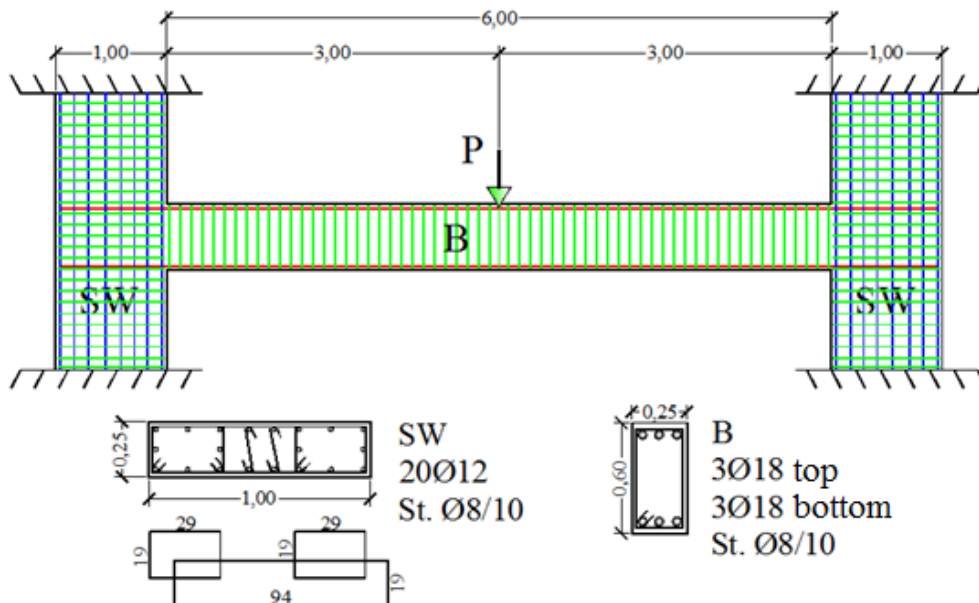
RC BEAM SUPPORTED ON TWO SHEAR WALLS. GEOMETRIC AND REINFORCEMENT DETAILS.
